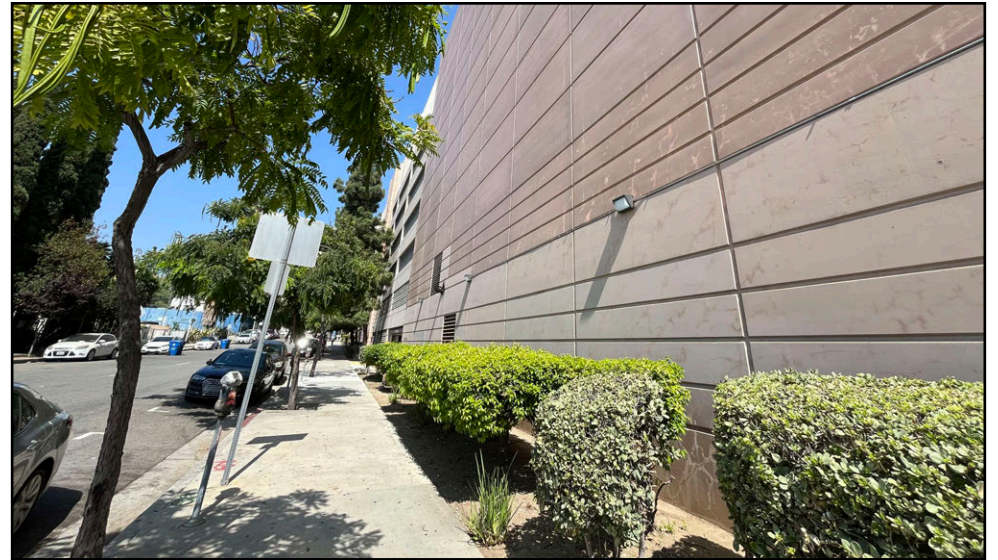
D: Portion of Project Site in between Kingston Ave and Britannia Street.
